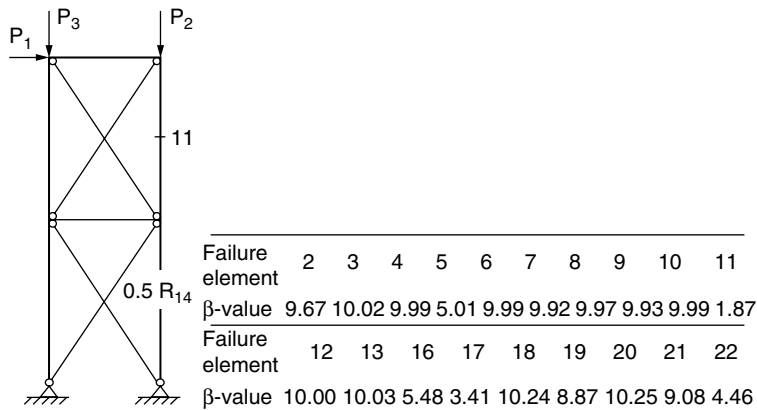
Modified structure when failure takes place in failure element 14.
